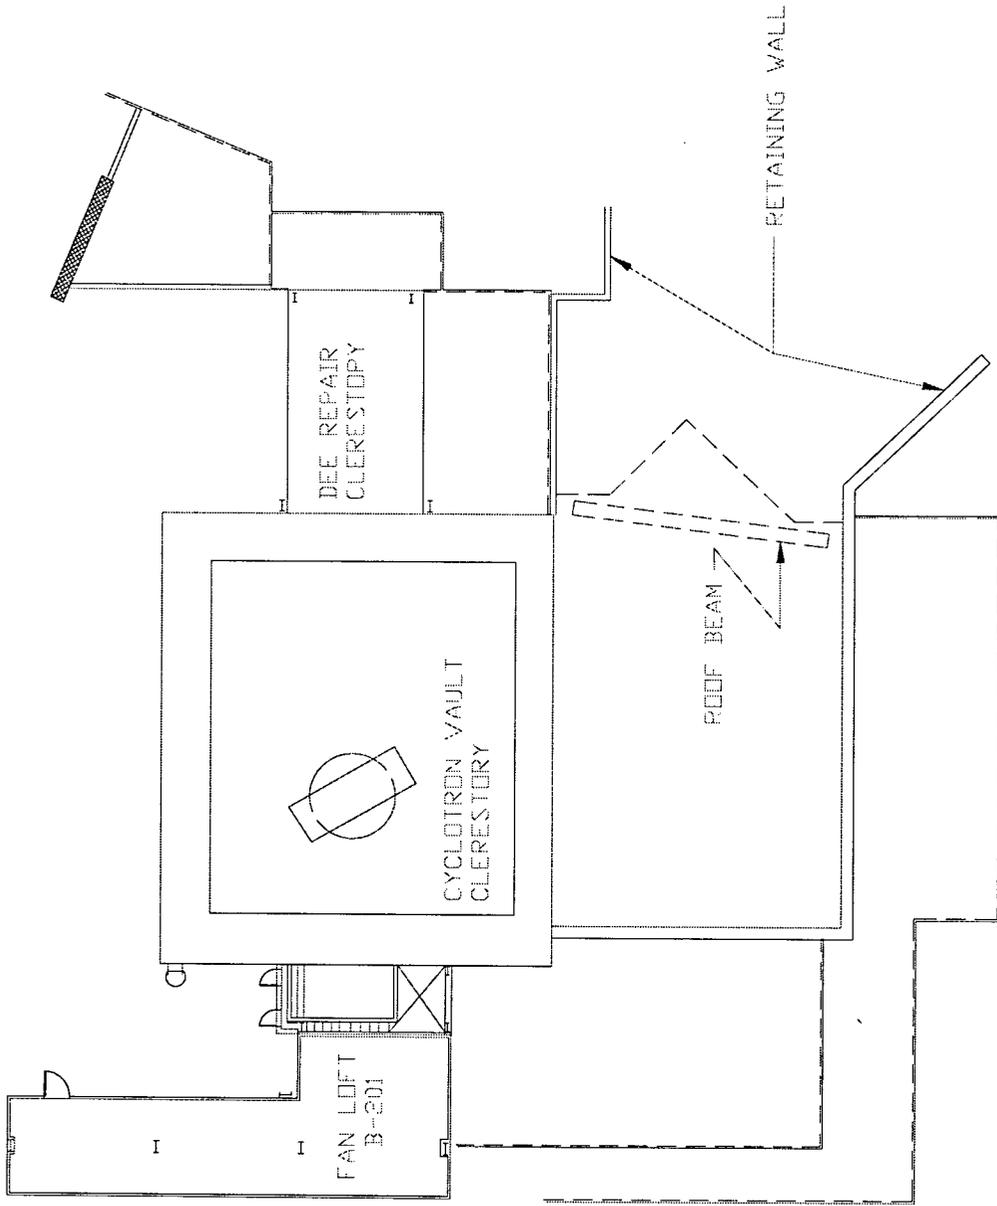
Building 211 Cyclotron Facility; Main Floor
